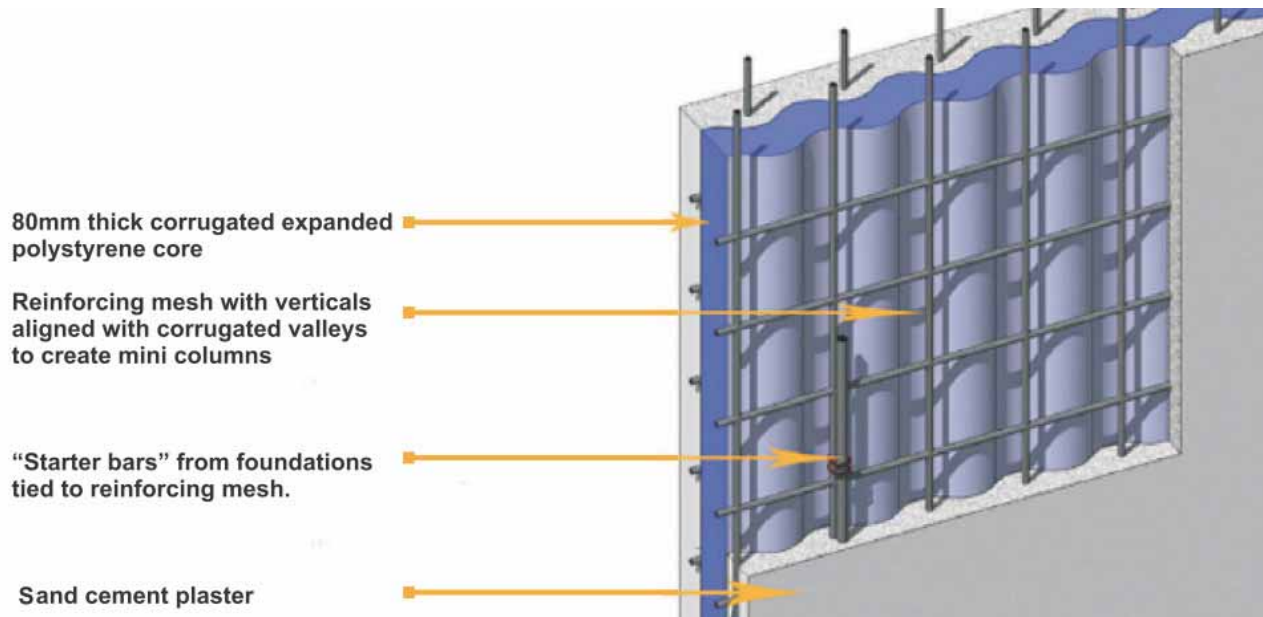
Ikhaya Futurehouse system, image courtesy of Ikhaya Futurehouse Systems, showing general design with corrugated EPS core
